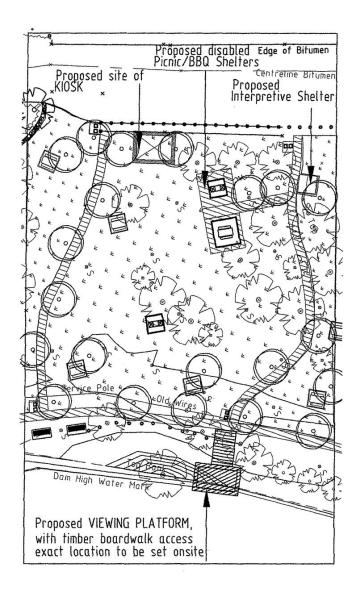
PLAN OF THE KIOSK PICNIC AREA
